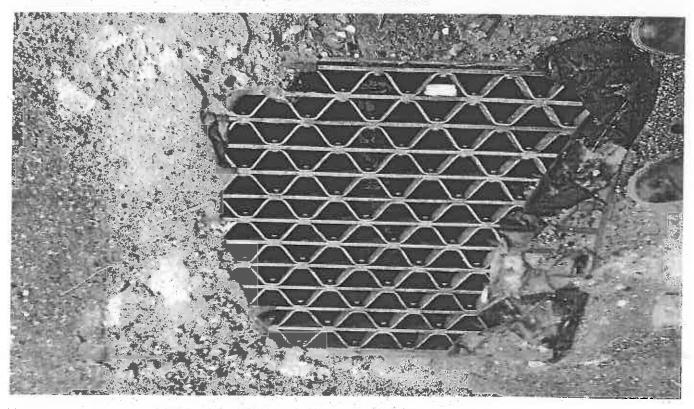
Exposed and unmaintained E and S (Atgrade inlet protection) North of the Site
